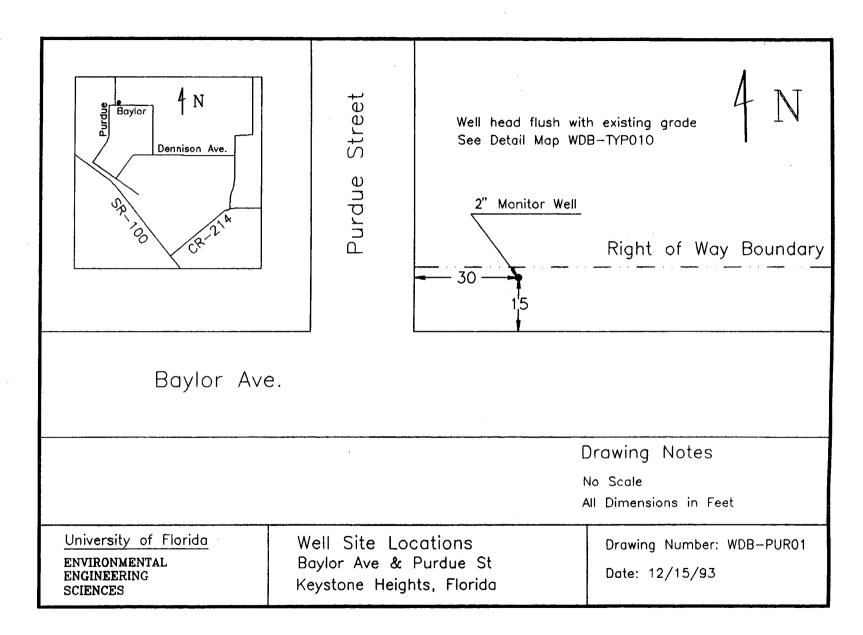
Location of Well 18: Baylor Avenue and Purdue Street
